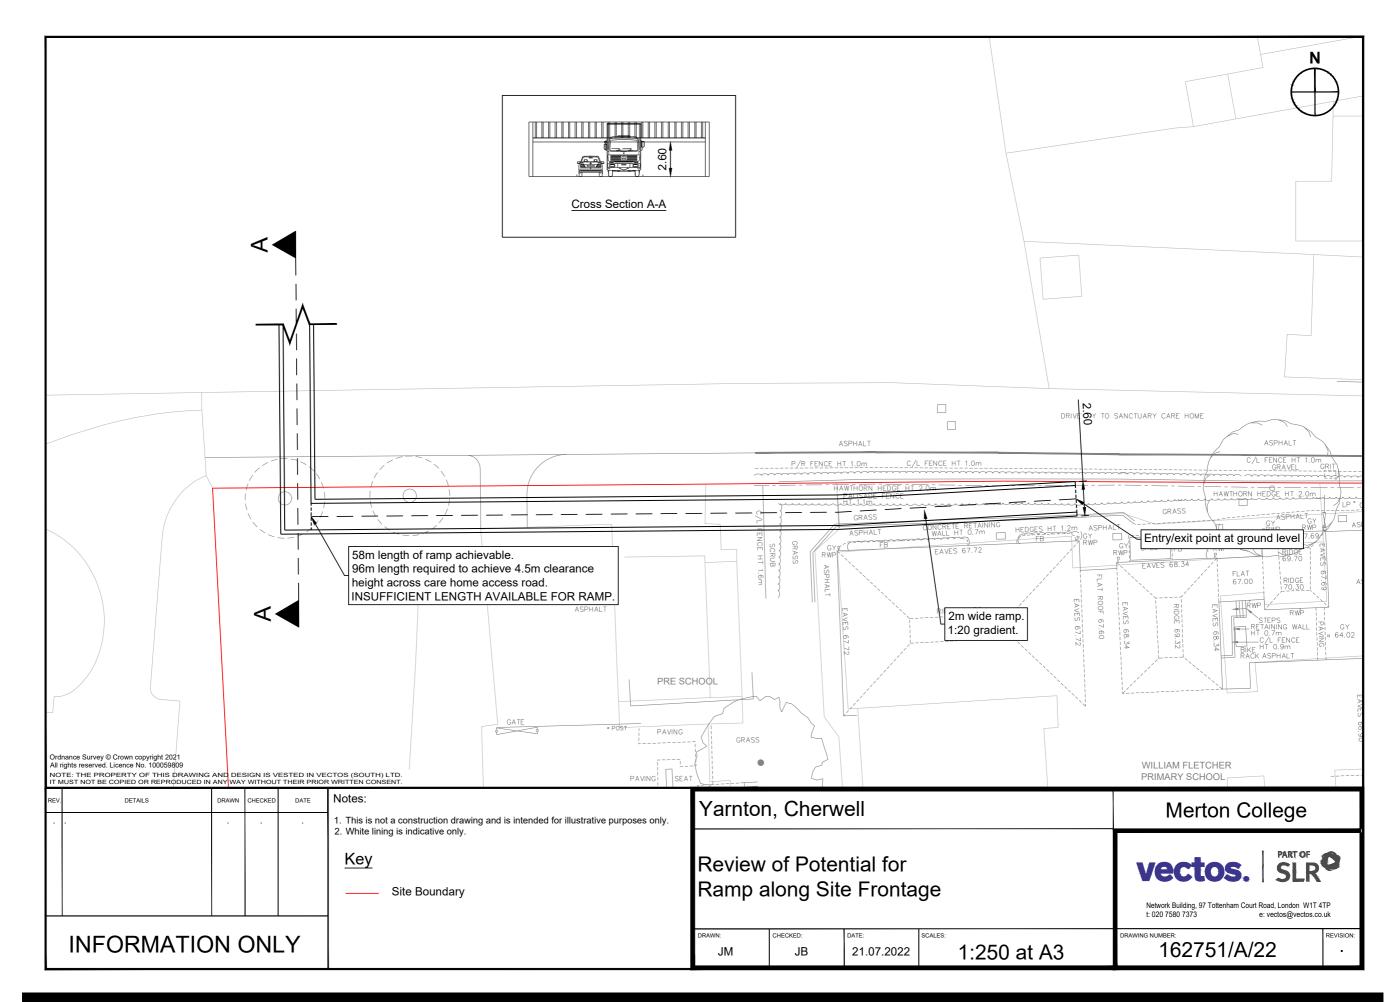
OPTION 5) RAMPED PEDESTRIAN OVERBRIDGE CROSSING OVER YARNTON RESIDENTIAL AND NURSING HOME ACCESS ROAD
